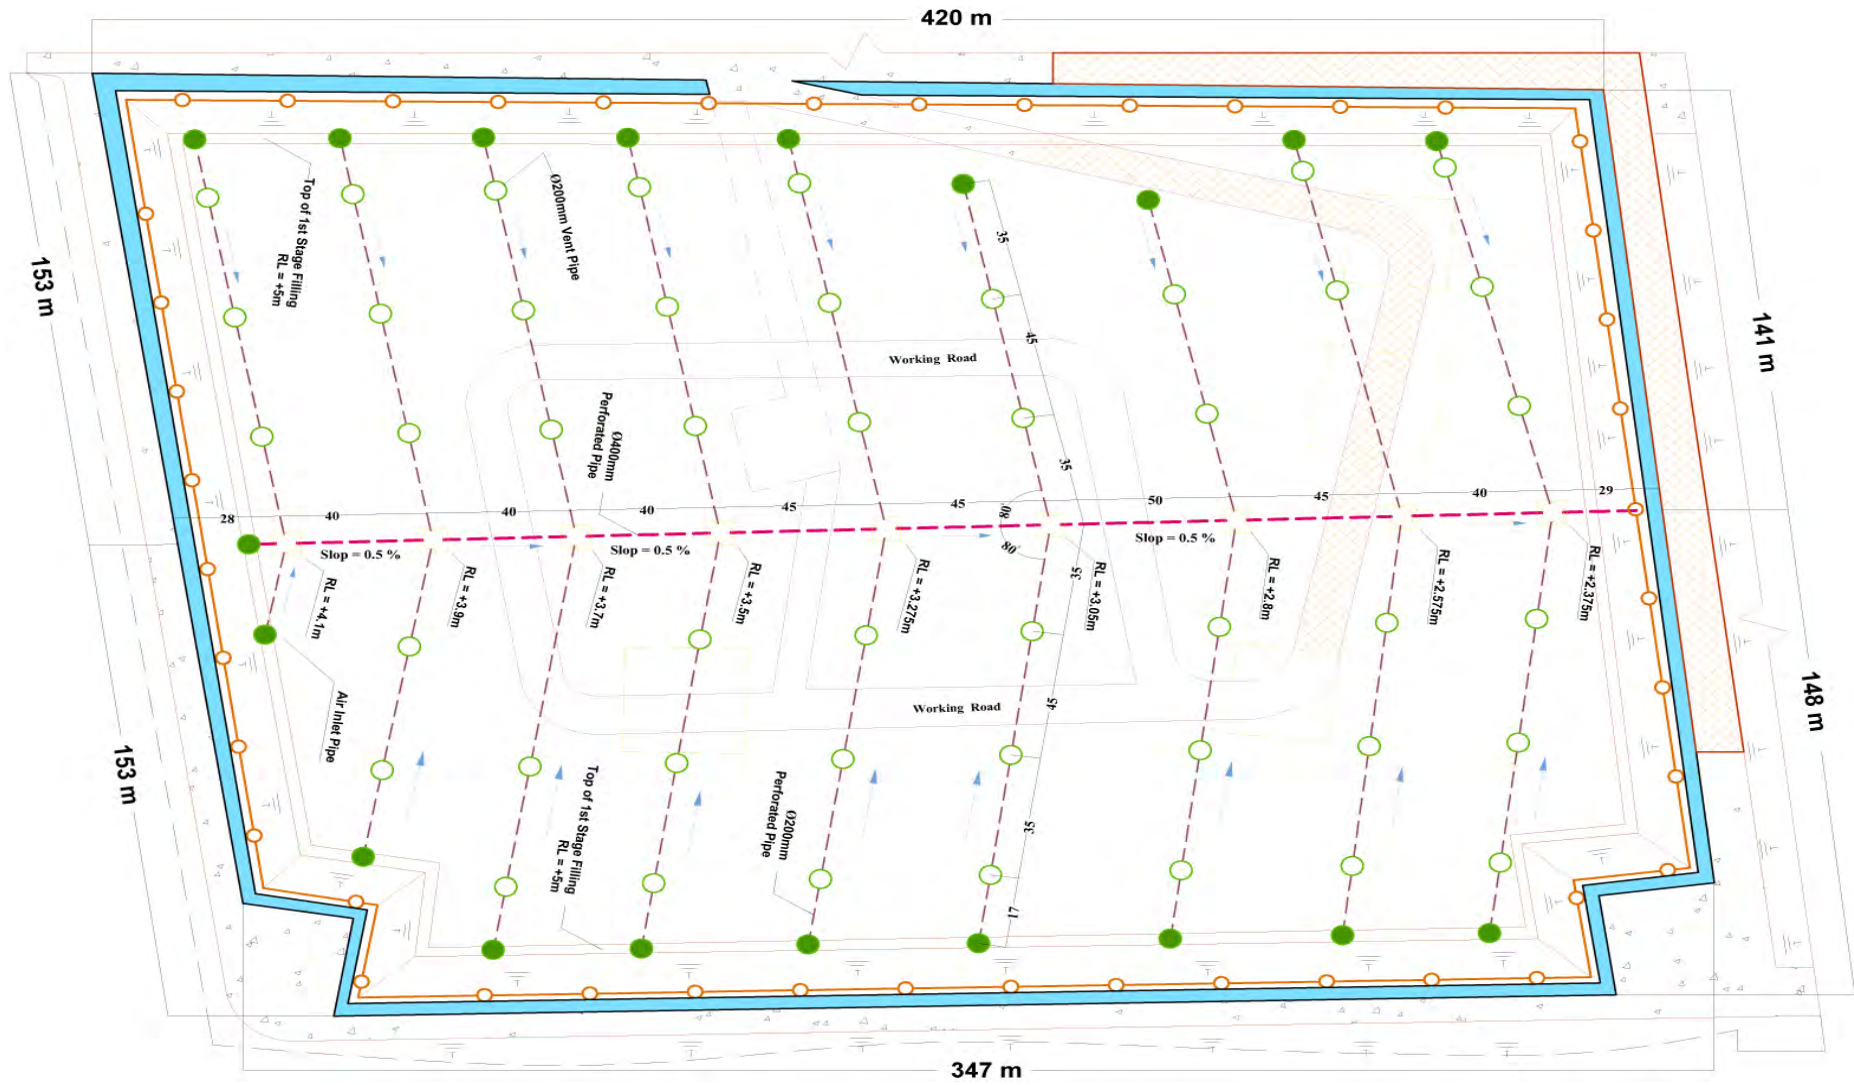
Layout Plan of Gas Venting System of Matuail Landfill Site Collected From WMD of DSCC
